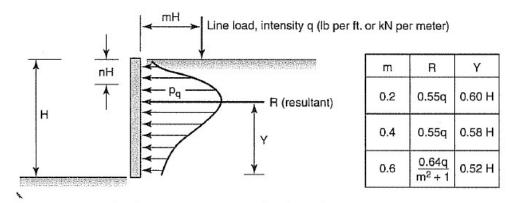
Pressure distribution against vertical wall resulting from line load of intensity q.
